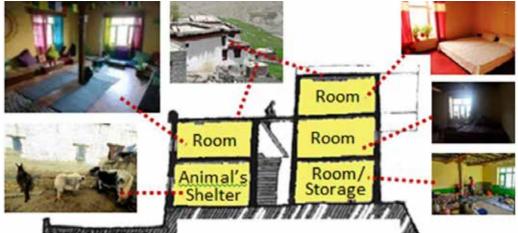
Showing Interior spaces in the Spitian structure (Source: Author)
